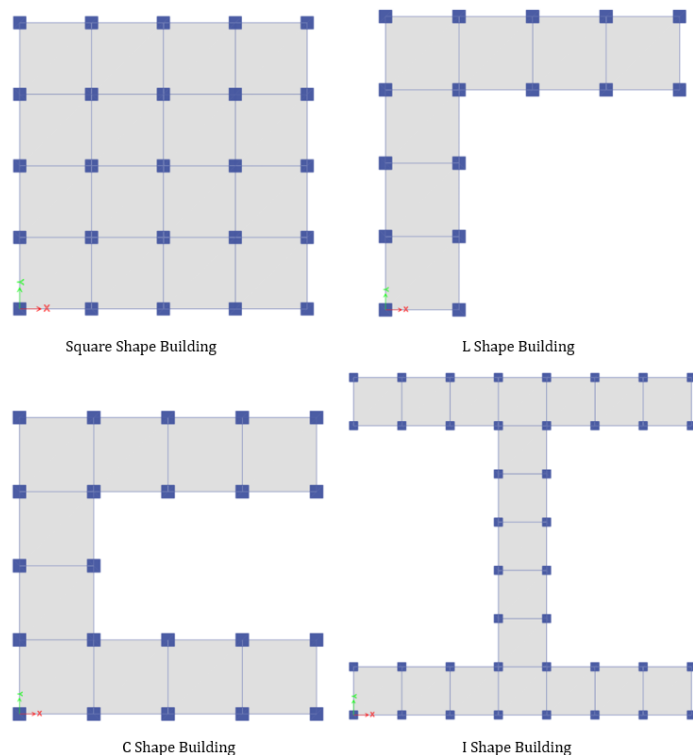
Plan view of ETABS Square, L, C & I Shape Building
